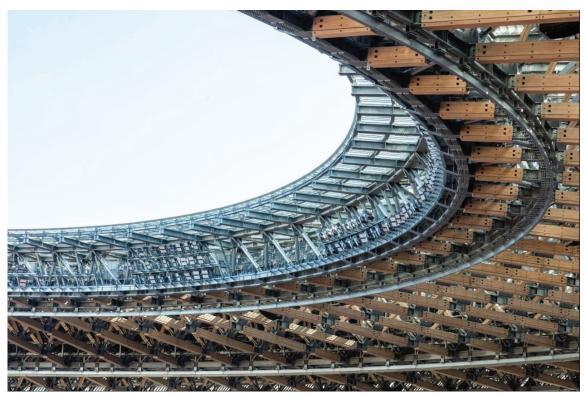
Japan National Stadium in Tokyo utilising timber beam as part of the roof structure © Kengo Kuma Associates
